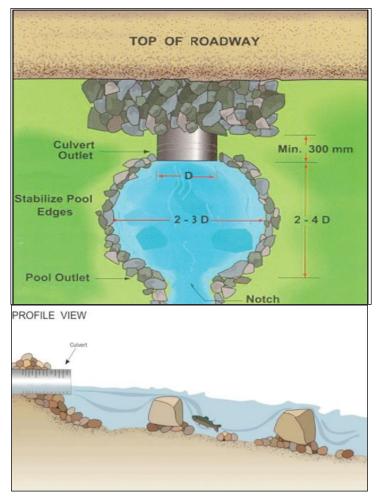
A schematic of a tailwater pool properly constructed with rocks and the recommended pool dimensions (above) along with a profile of culvert and pool construction (lower)
